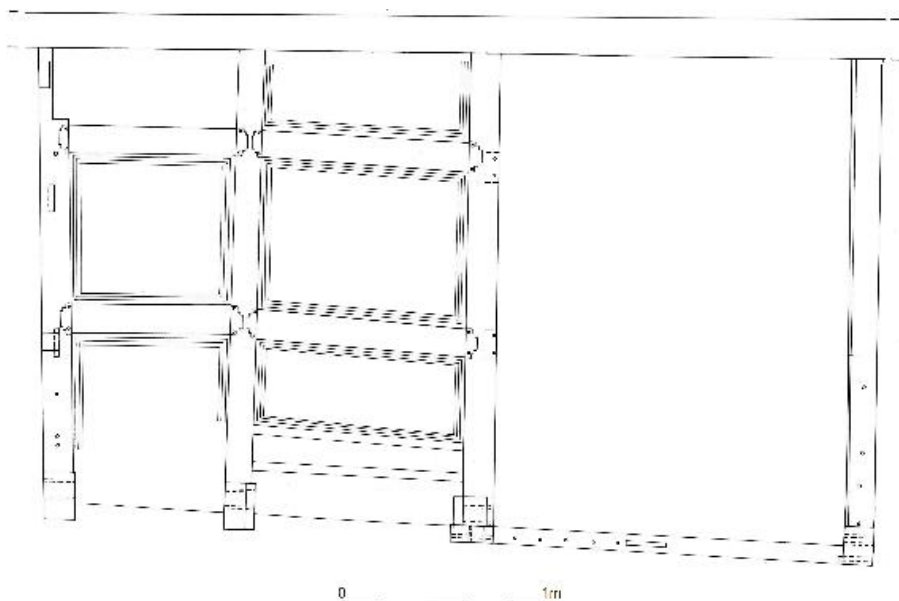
Drawing of a section of the ceiling/floor-frame structure of 18 High Town
